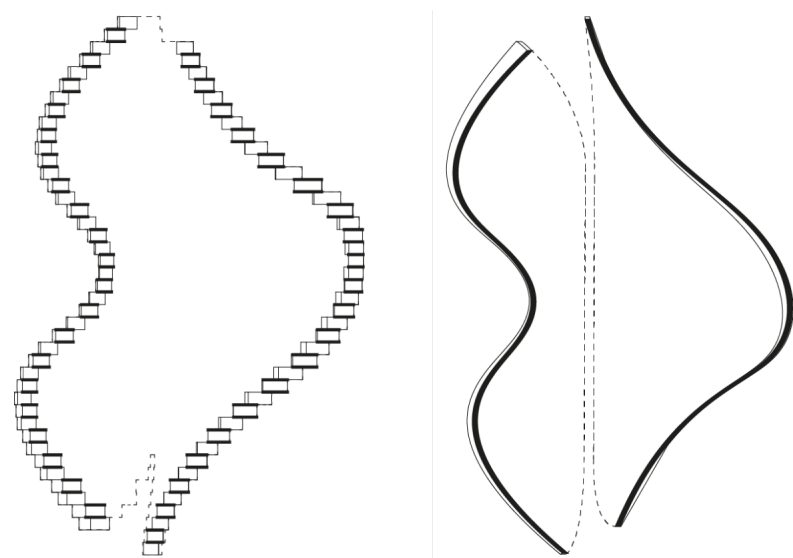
Plan drawings for R7 (left) and R8 (right).
